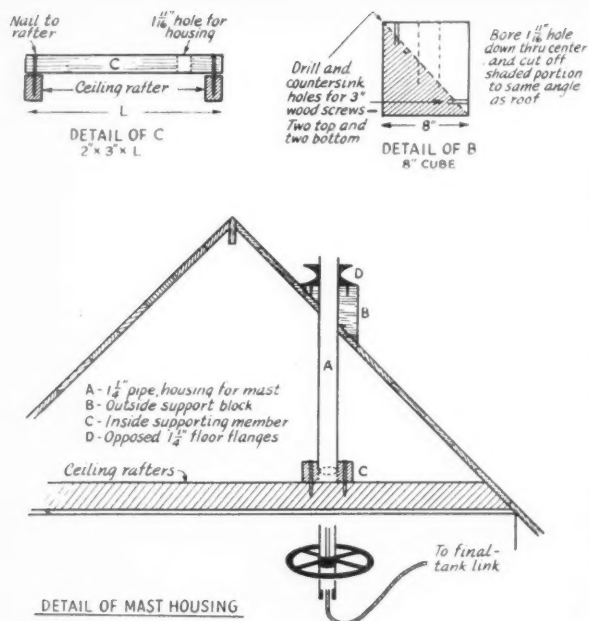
Sketch showing the attic housing, with the mast protruding through the operating-room ceiling and automobile steering wheel for turning the antenna. Dimensions of the housing and mast will depend on the individual location.
